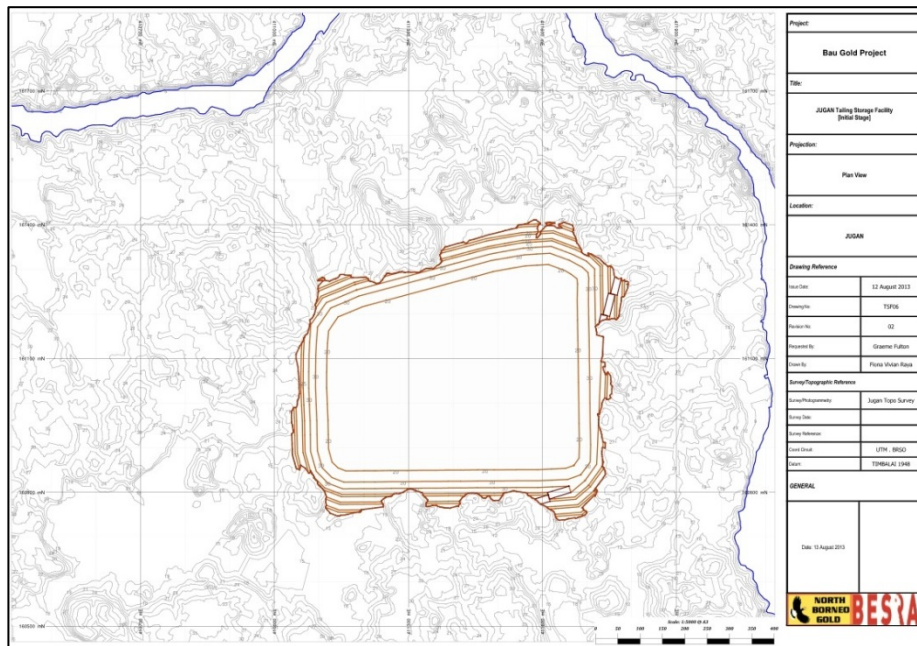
Plan View of Stage 1 of TSF at Jugan
